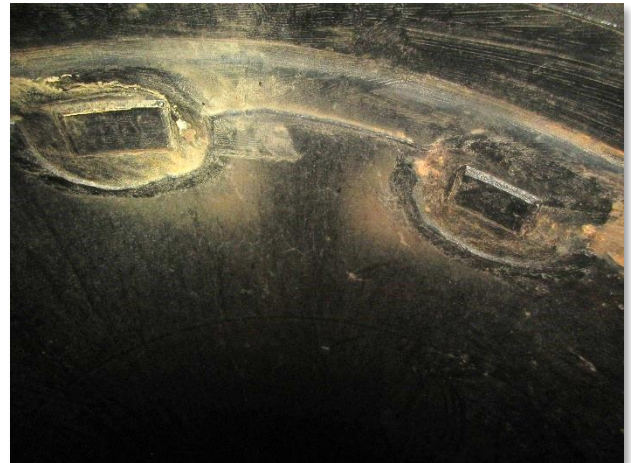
Example of weld plate repairs on outfall pipe.
